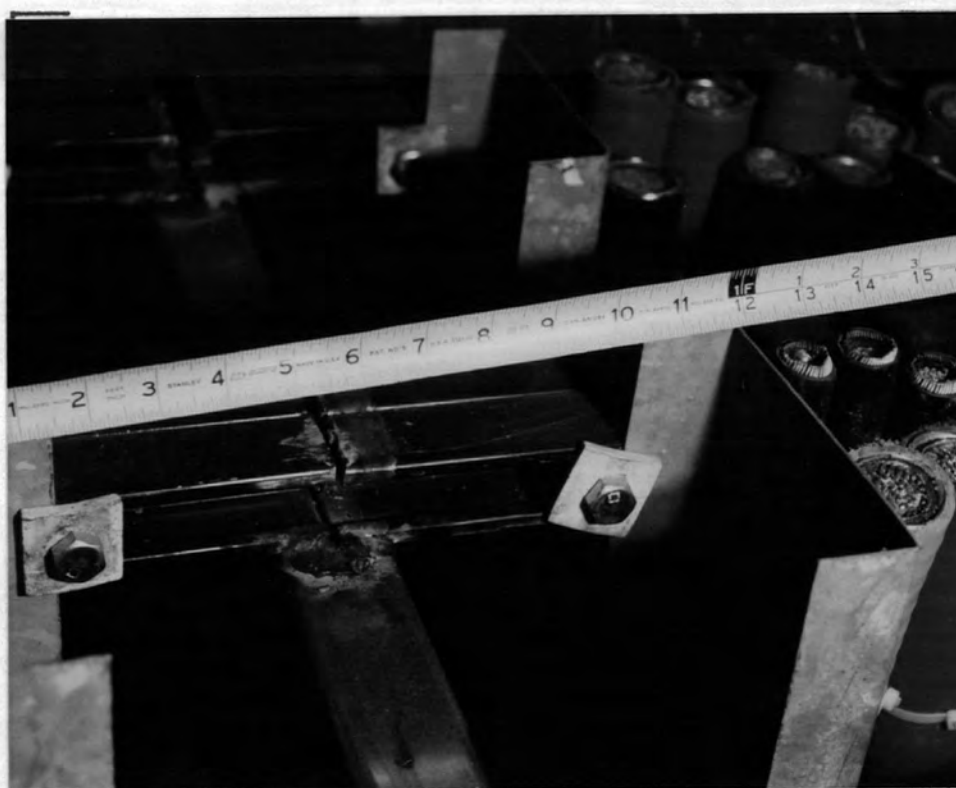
PLACEMENT OF CABLE AND CABLE TRAY
